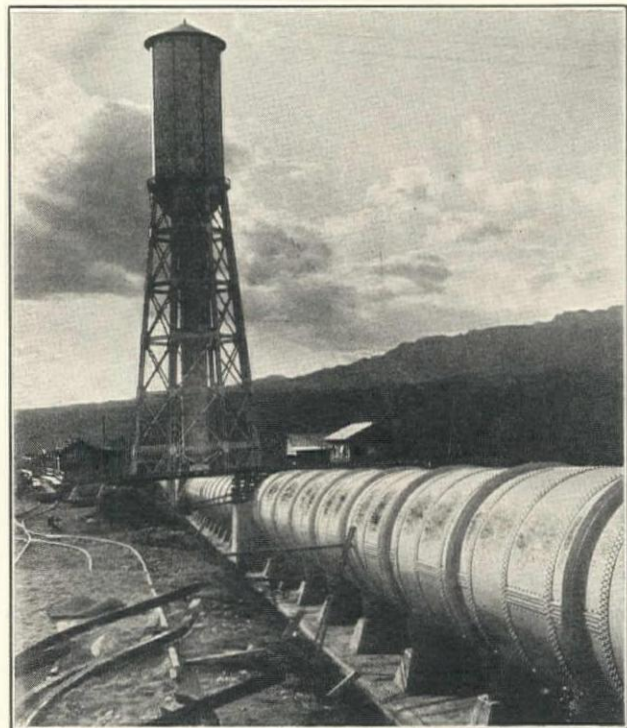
Steel Pressure Pipe 11-in. Diam. on Steel Saddles, with Anchor Block in Center Foreground, and 41-ft. Diam. Differential Surge Tank in Background, Height to Roof 262 ft.
